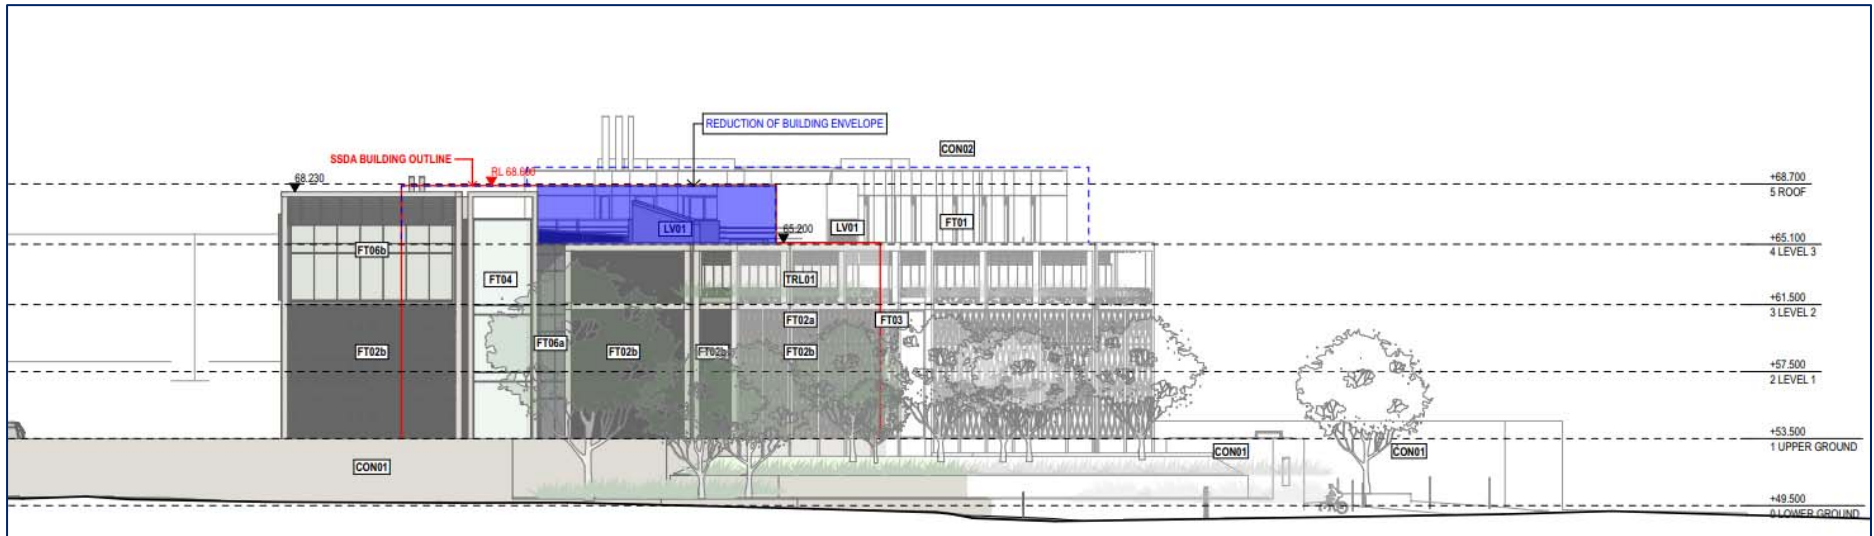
| Southern elevation – Stages 1A and 1B complete (Source: Applicant's SRtS)
